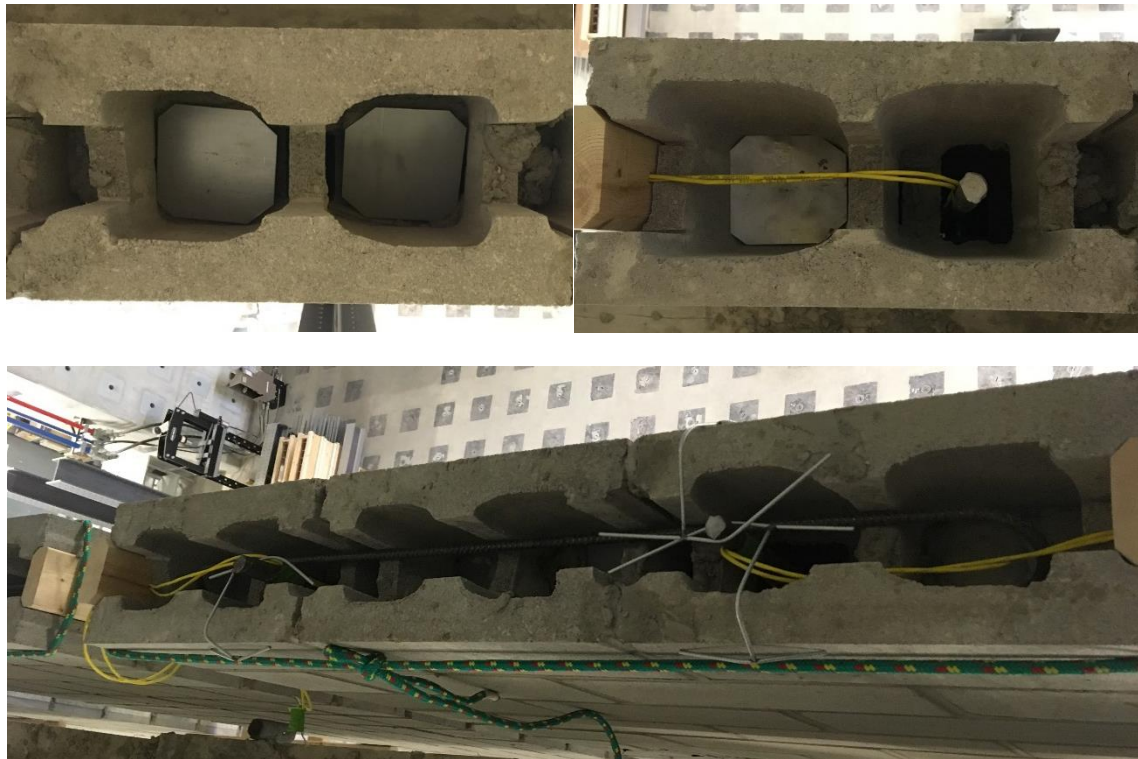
Positioning of reinforcement and flashing to allow grouting of the top course of masonry: Conventional wall
